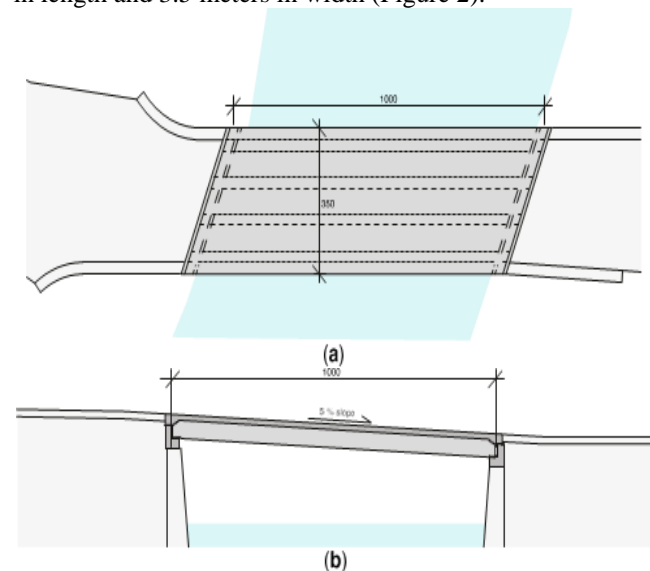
Bridge situation and main dimensions: (a) plan view; (b) elevation.
